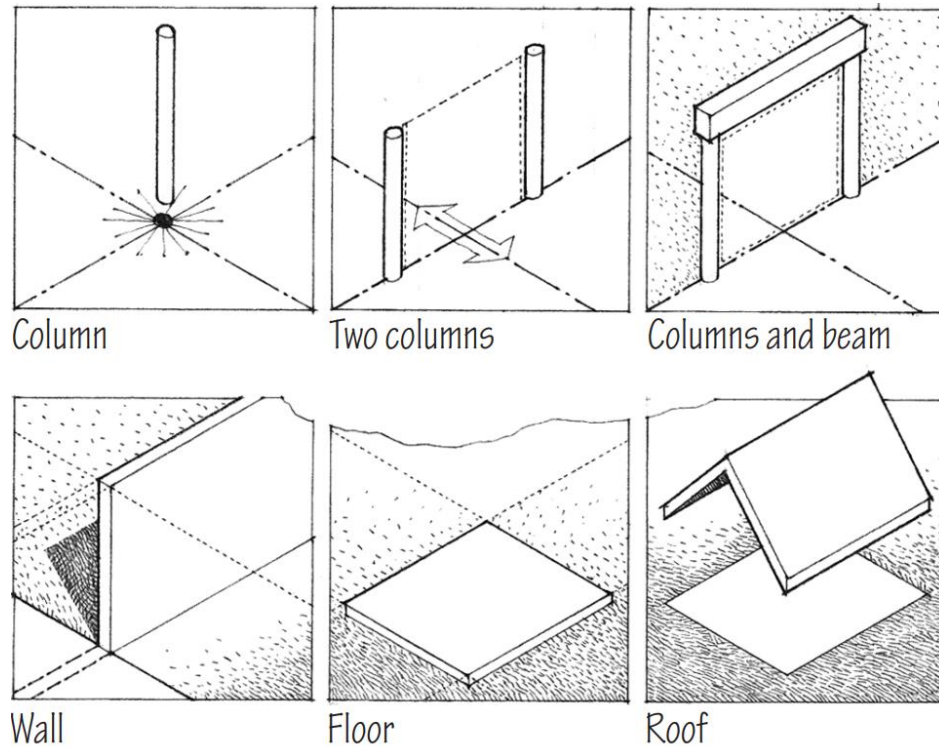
Fundamental Elements of a Building which are Organized in Giving Form to a Building (Ching & Binggeli, 2018, p. 3).
